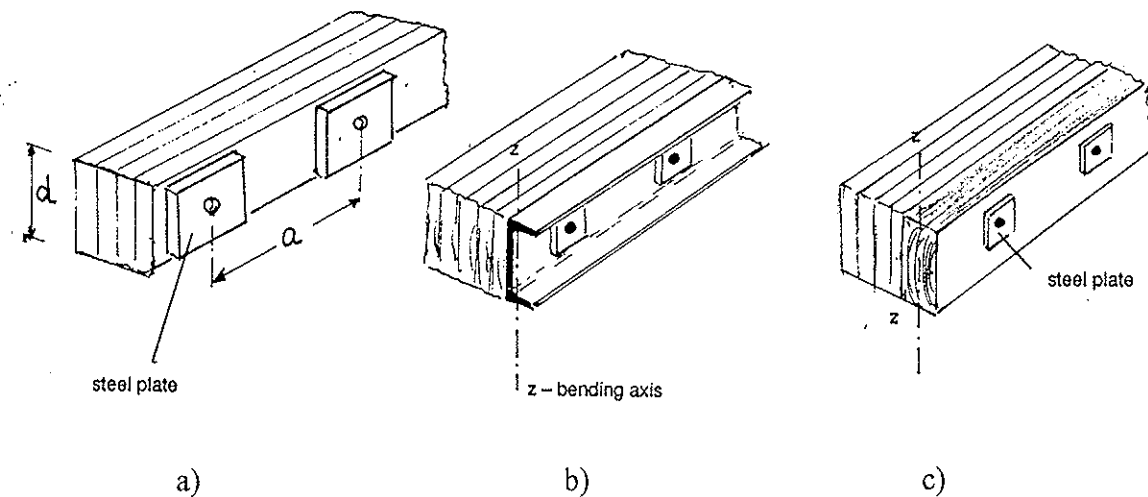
Examples of anchorage details. (a) steel anchorage plates, (b) steel u-shaped bulkhead, (c) wood bulkhead
